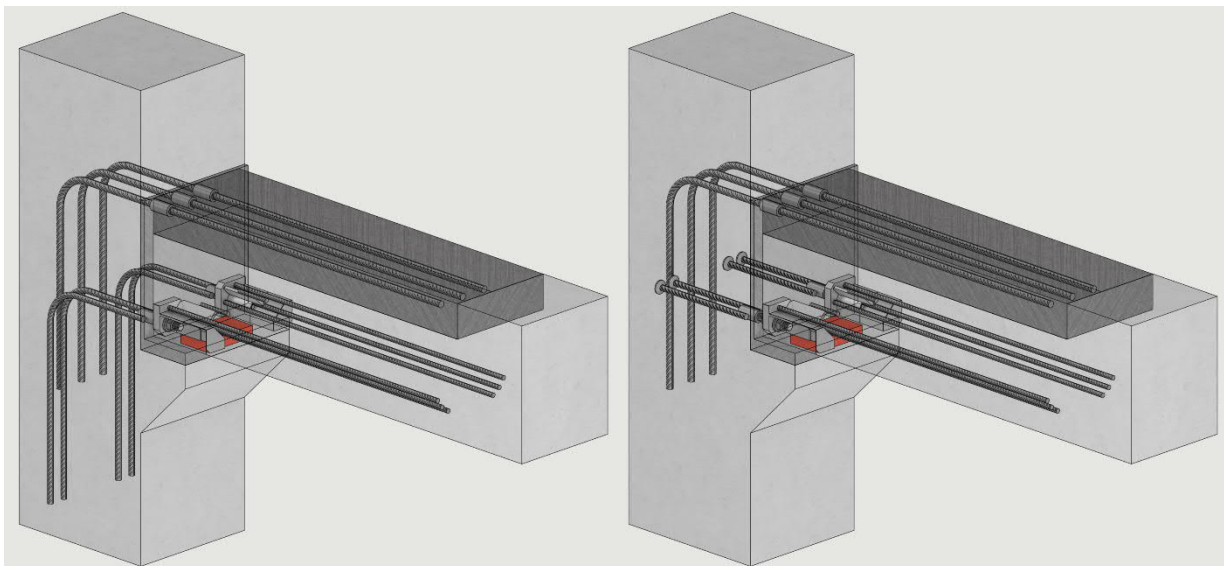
Beam shoe/rebar coupler connection in the rigid frame structure of a building
